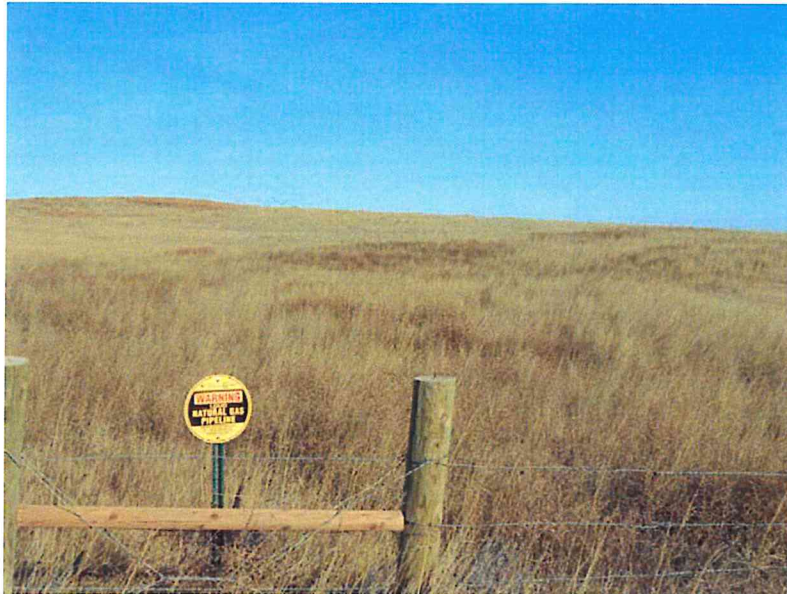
Direction: West – Showing revegetation at ND Highway 1806 road crossing near pipeline mile marker 1.
